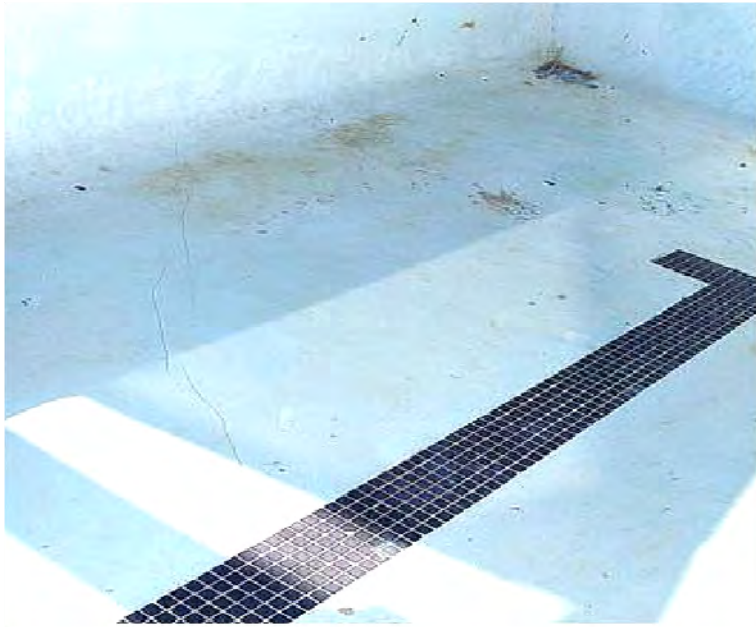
90 Degree Trans-Pool Cracking Patterns
